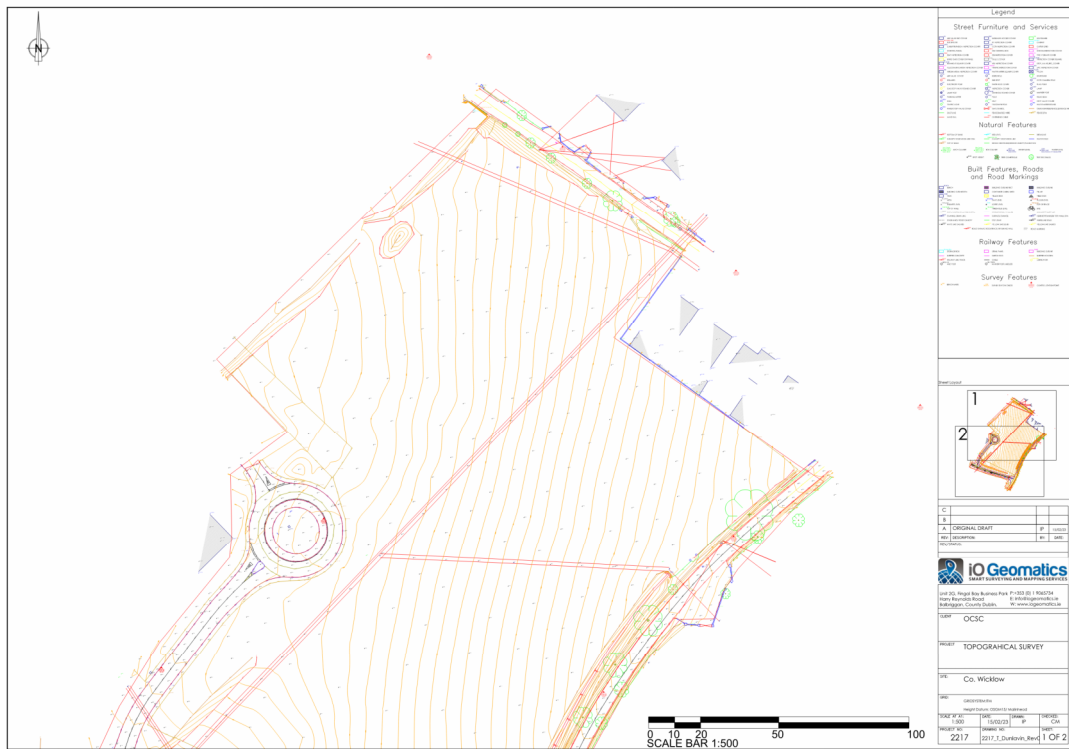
Causeway Geotech Topographical survey, Drg 2217 T Dunlavin Rev0, p1/2
